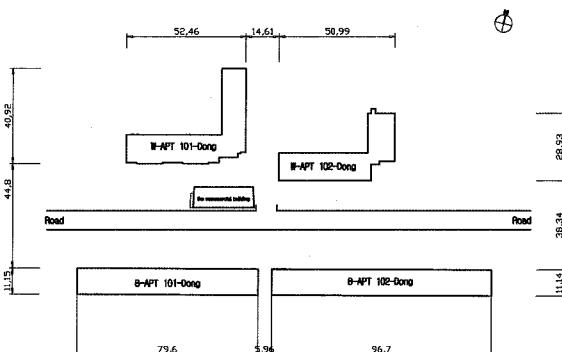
The layout of apartments surveyed and space between the apartment buildings.
